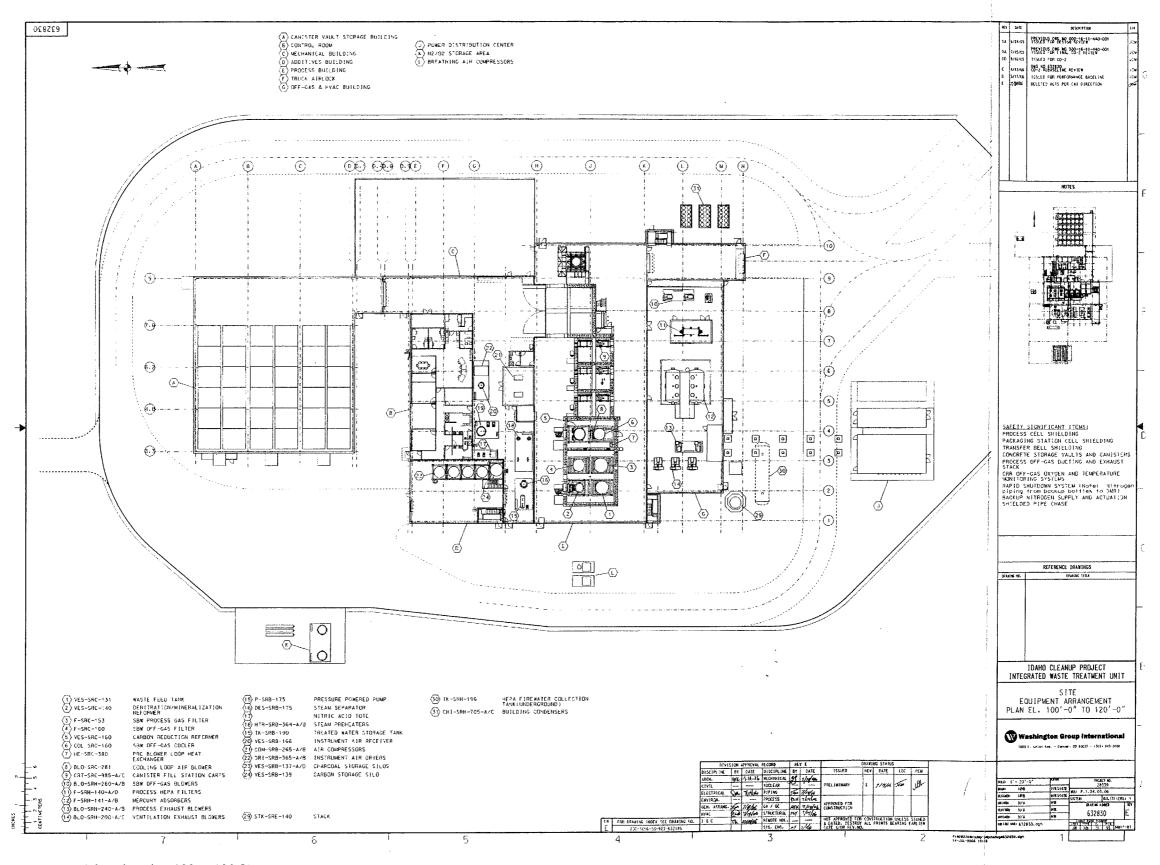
Site equipment arrangement (plan elevation 100 to 120 ft).
